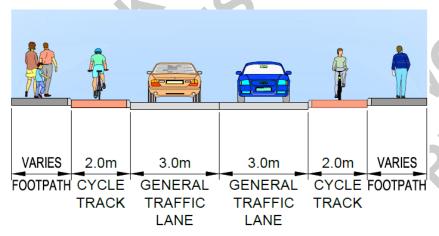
Section 1, Proposed Option 4 – Cross Section B-B
